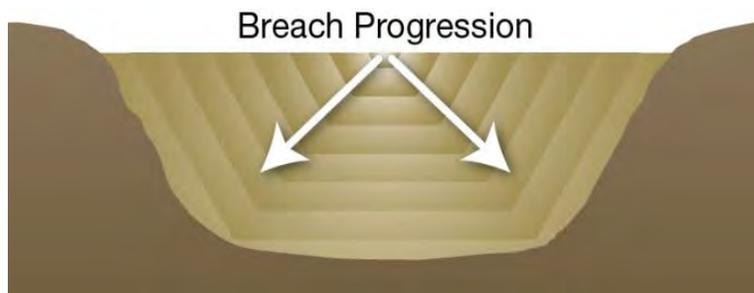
Overtopping trapezoidal breach progression (Gee, 2009)
